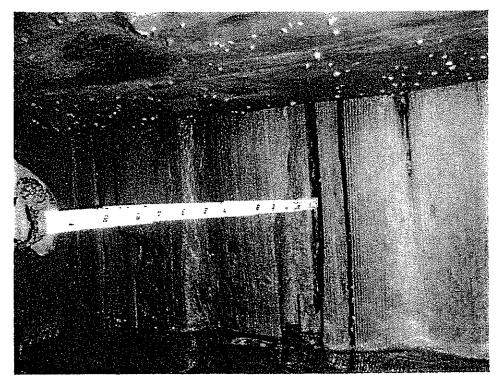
General view of deterioration in timber sheet pile bulkhead. Note penetration with the ruler exposing voids behind the bulkhead.
